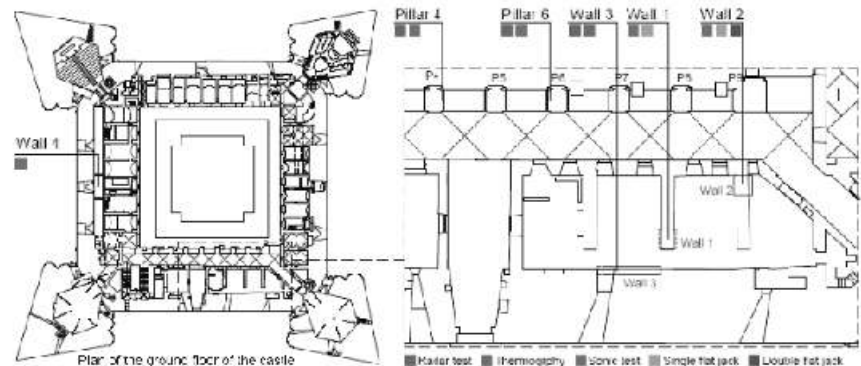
Plan of the Spanish fortress: position of the tests at the ground floor of the SE wing
